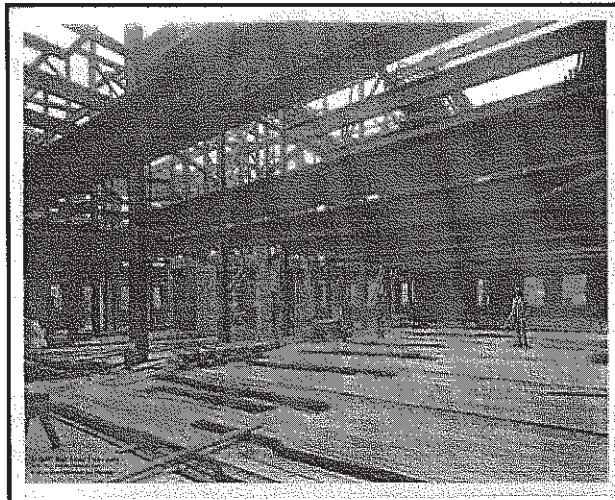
, left.: Construction Photograph, looking up from ground or first floor, showing the heavy steel structural framework and part of the concrete work in the background center. Courtesy of the Drawings and Documents Archive, Ball State University, 23-18B-007_s_1.
